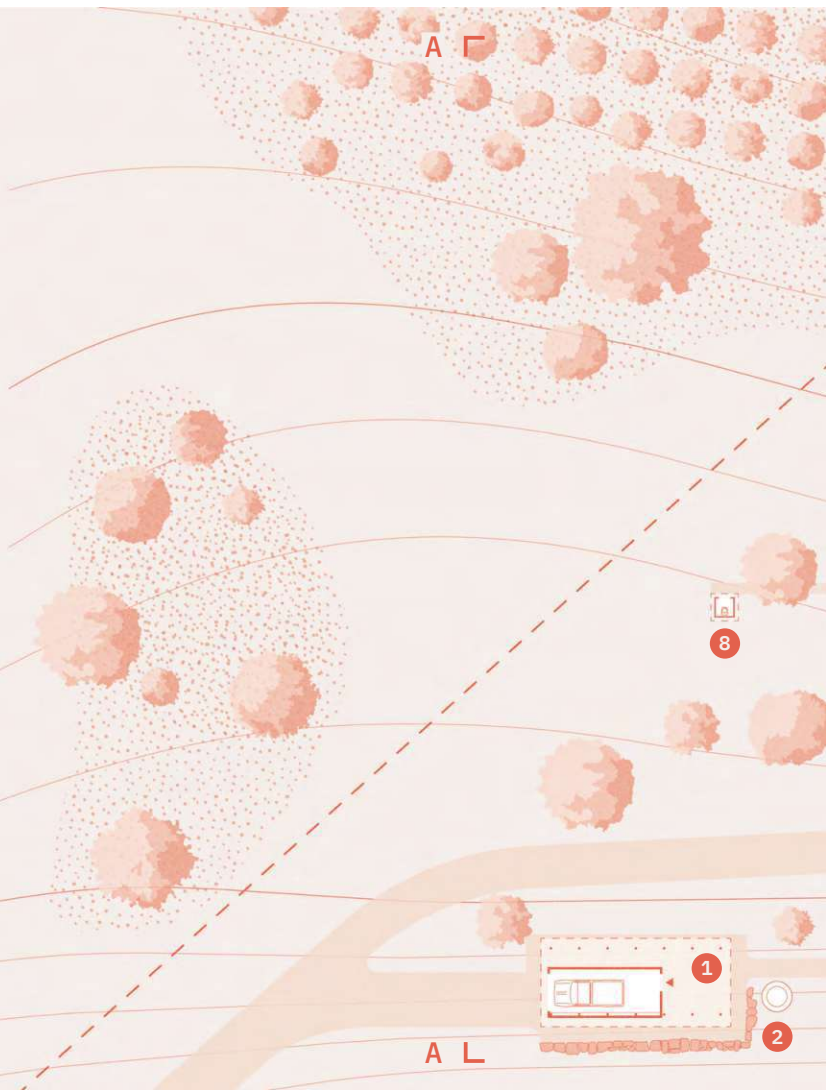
Homestead Layout; 1:500. The drawing shows the main elements and layout of the building site.
